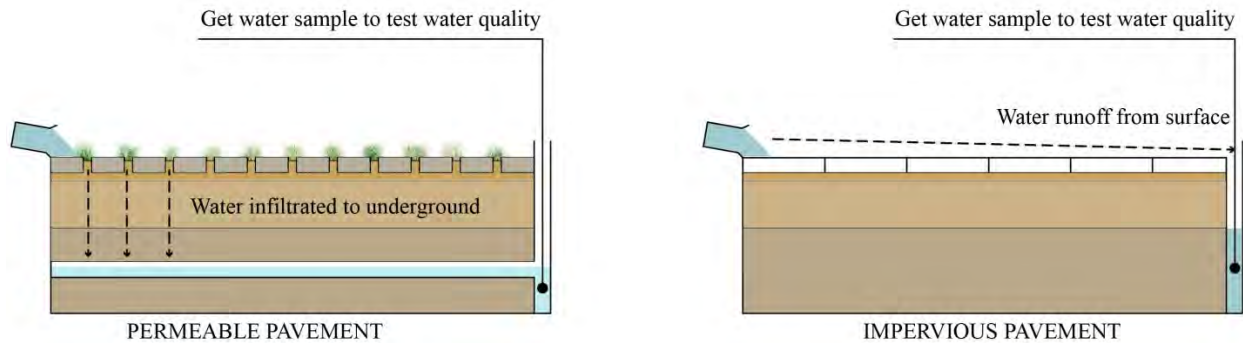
Get water sample to test water quality that runs through permeable pavement and impervious pavement
